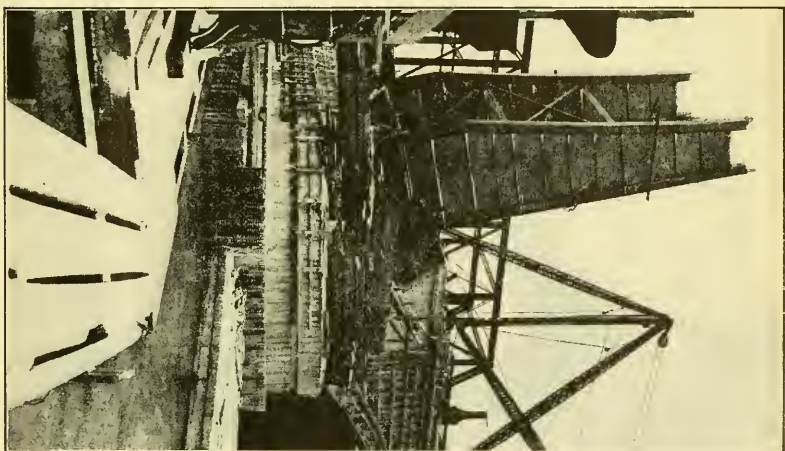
PROGRESS VIEW, WINTER, 1912-13, LOOKING WEST. FIRST HALF OF BRIDGE NEARLY COMPLETED, OLD BRIDGE STILL IN USE.
